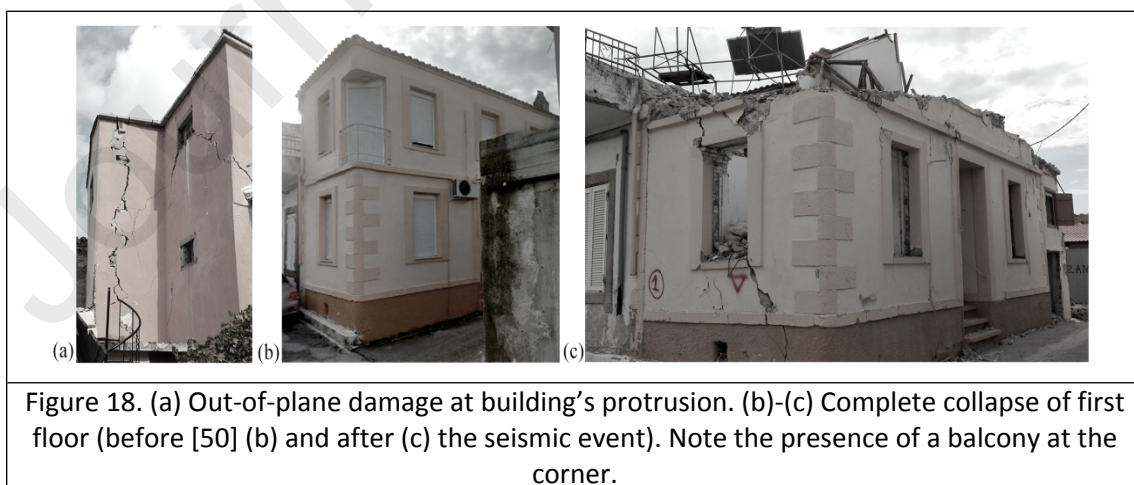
(a) Out-of-plane damage at building's protrusion. (b)-(c) Complete collapse of first floor (before [50] (b) and after (c) the seismic event). Note the presence of a balcony at the corner.
